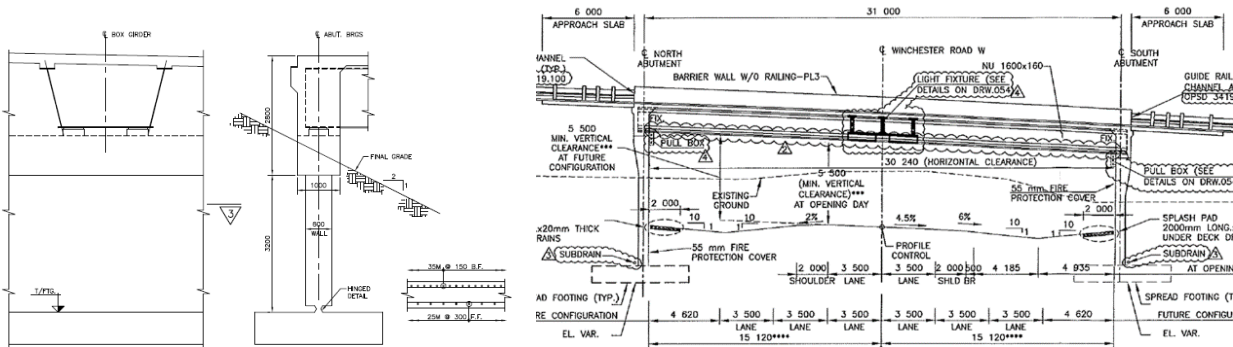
Examples of integral abutments on shallow foundations where a solid wall provides flexibility above a spread footing
